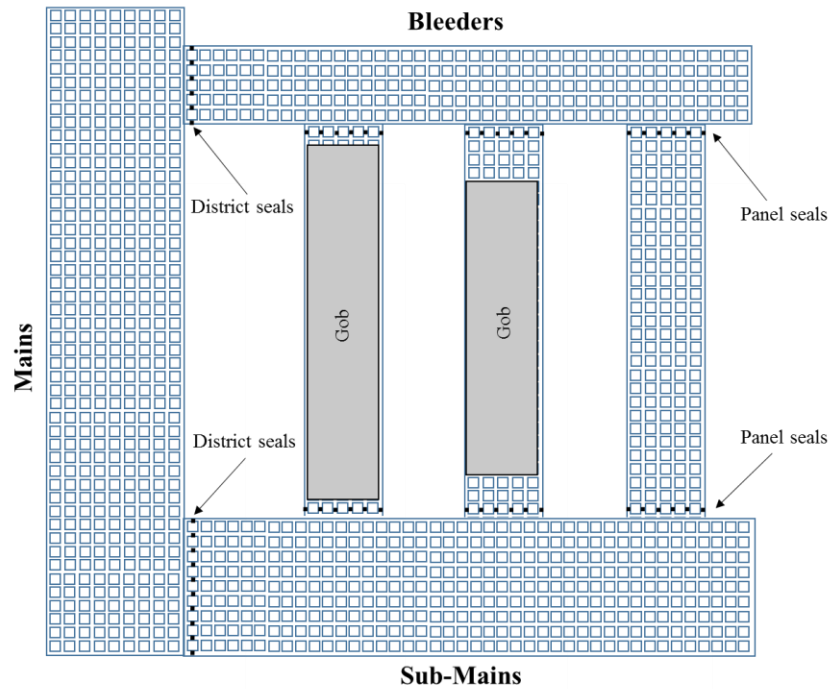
Seal placement in a typical room and pillar underground coal mine
